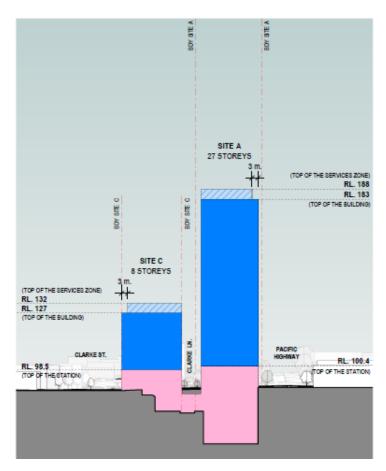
B: Proposed Crows Nest OSD building envelopes – cross section through the site (east-west)
